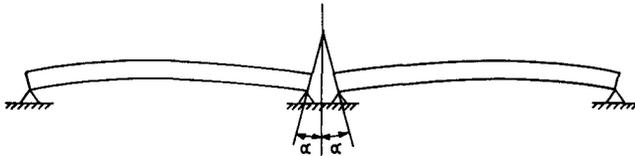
Construction sequence for a two-span bridge with precast, prestressed girders made continuous for live loads
